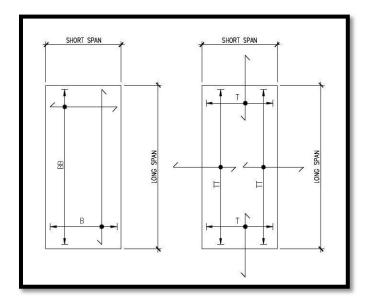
This symbol shows that the installation of short or long iron steel can be mounted in vertical or horizontal.
